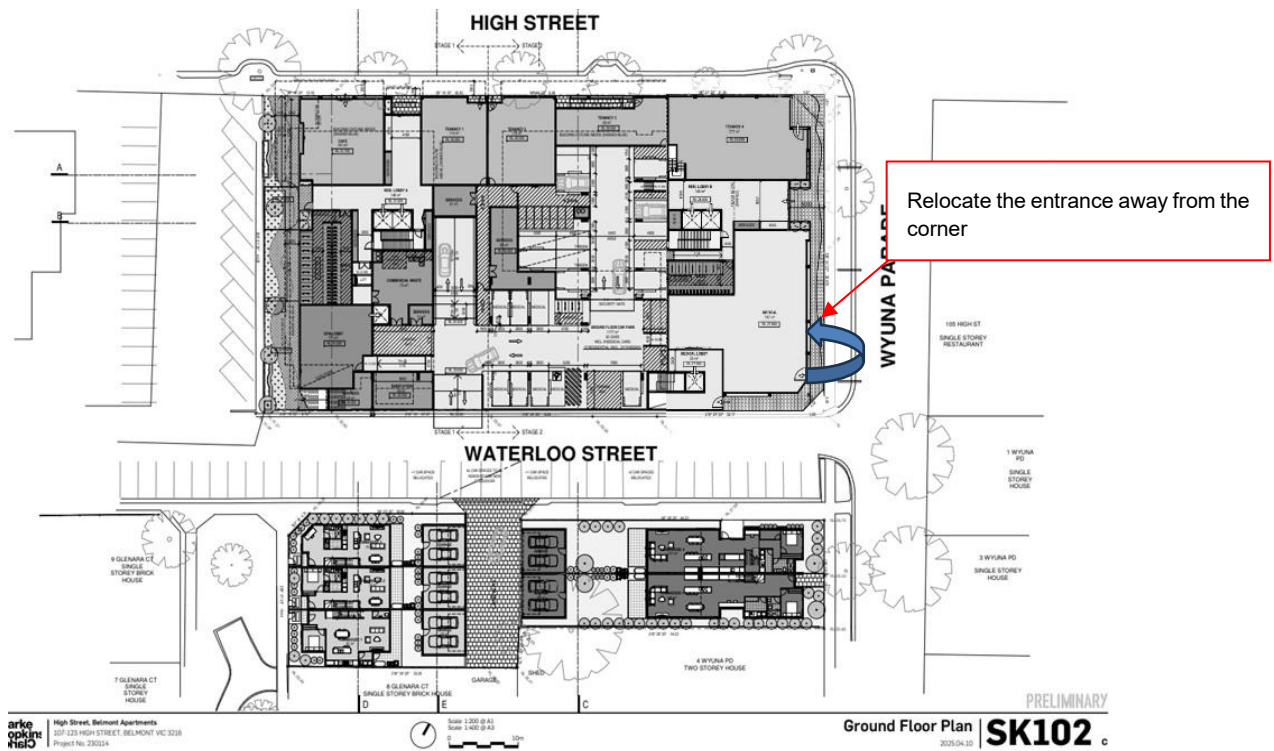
ground floor plan with the recommended wind control measures overlaid.
